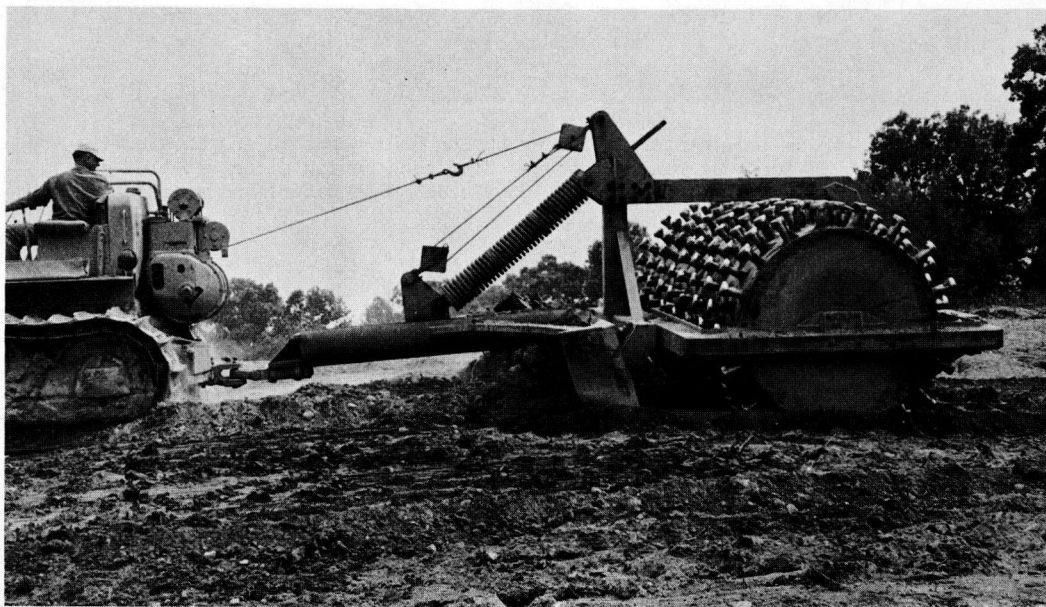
Tamping roller equipped with adjustable level blade to produce a level course while compacting.
